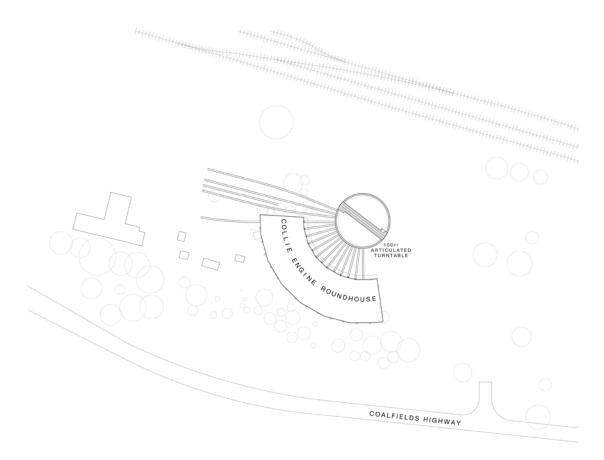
Collie Roundhouse with Turntable site plan. (DPLH, 2018)
